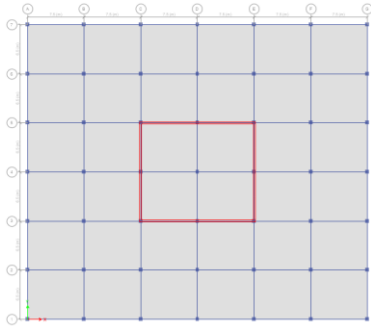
Plan shown with SWP-02[Shear wall position-02] .
